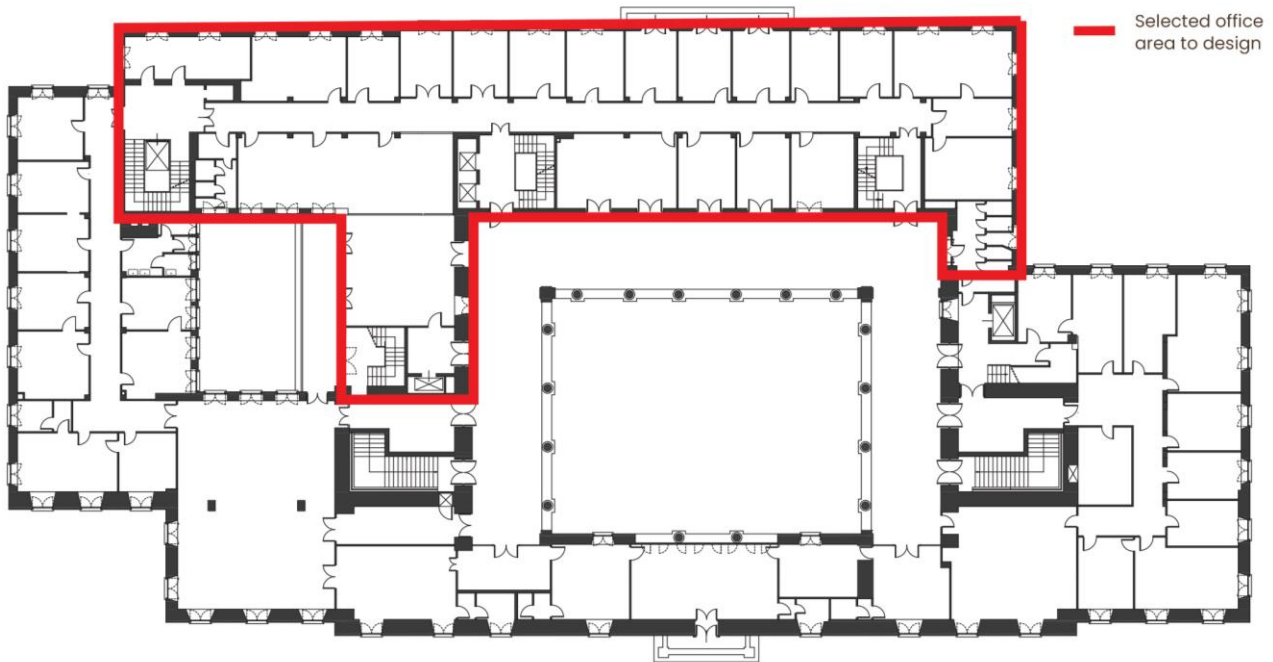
The existing first-floor plan and the selected area. Scale 1:500 (General Information Units)
